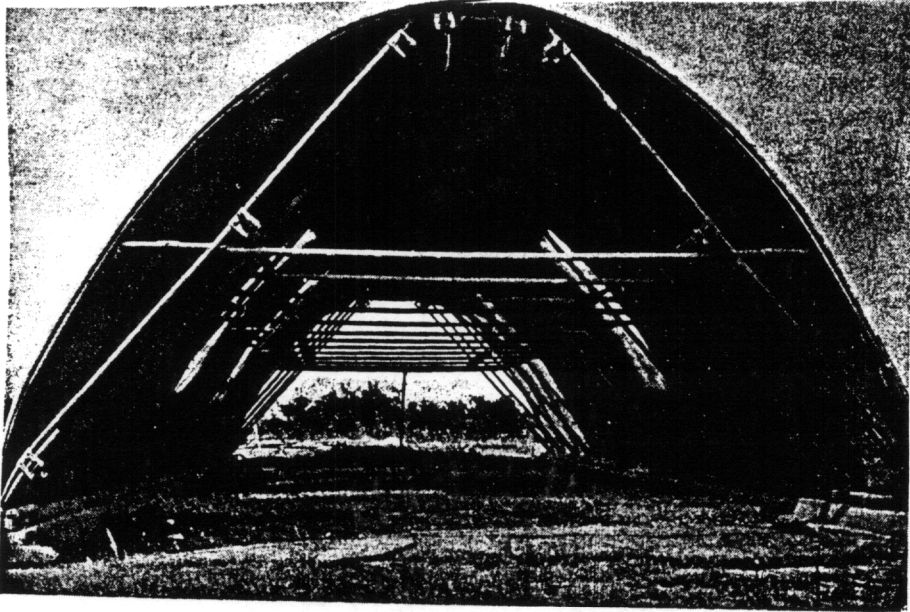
"Flexible jute fabric draped over steel arch ribs provides a simple formwork for pouring a thick arched concrete shell of corrugated section." A building at Umtali, South Rhodesia. (Engineers: Barchild Constructions, Ltd.) (Michaels, 1950, p. 117)
